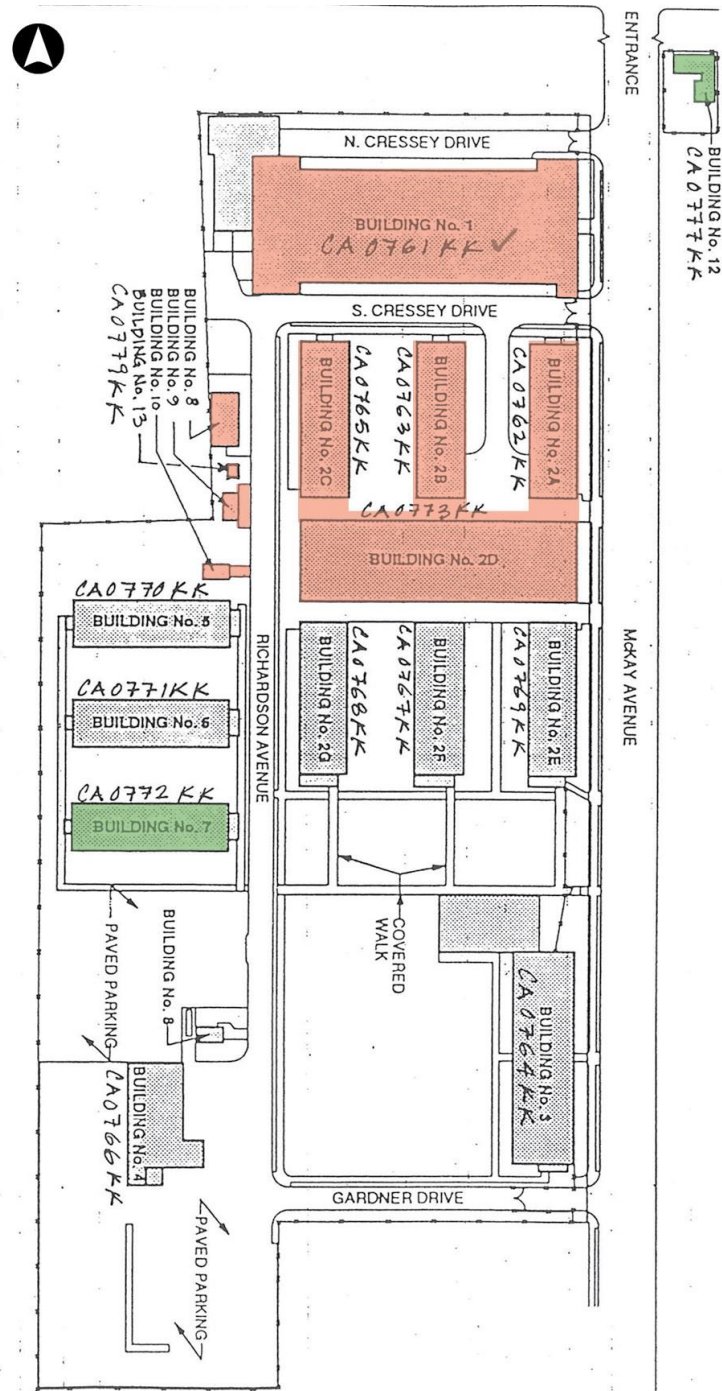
All buildings shown were evaluated in 1996 as part of the Alameda Federal Center. Subject buildings shaded red. Extant original building outside of subject parcel shaded green. Three barracks wings of Building 2 (Buildings 2E, 2F, and 2G), as well as Buildings 3, 4, 5, and 6 have been demolished. Source: Page & Turnbull HBPP, edited by Page & Turnbull.
